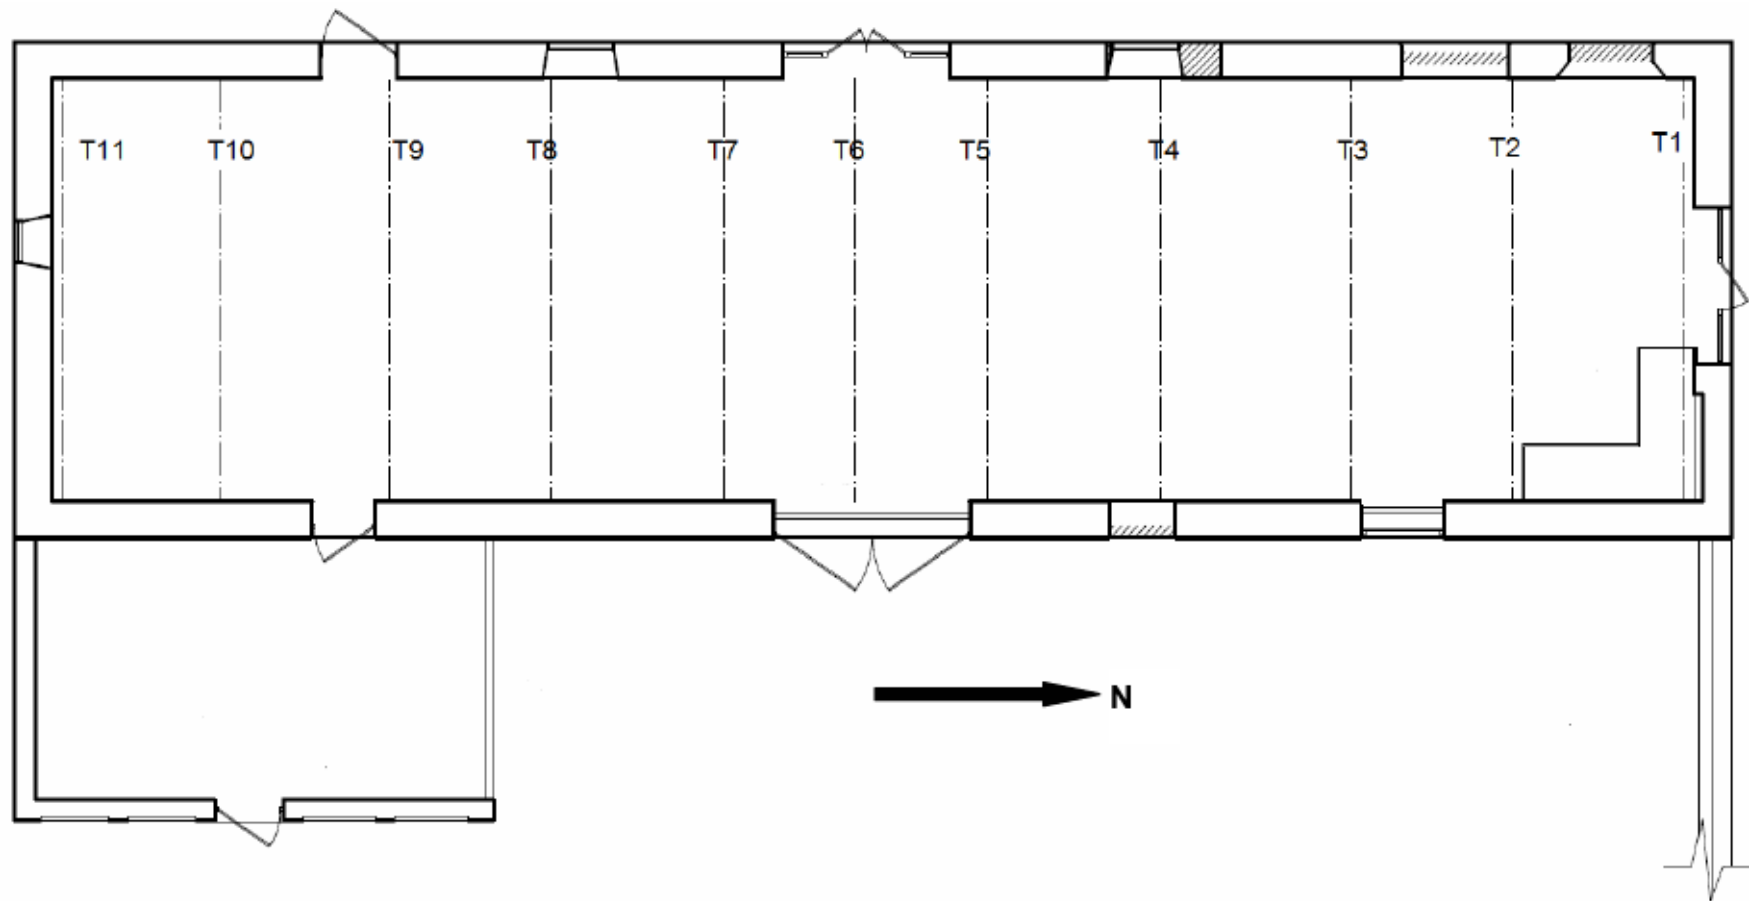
Ground-floor plan; showing truss locations (Wood and Stephen Design Management)
